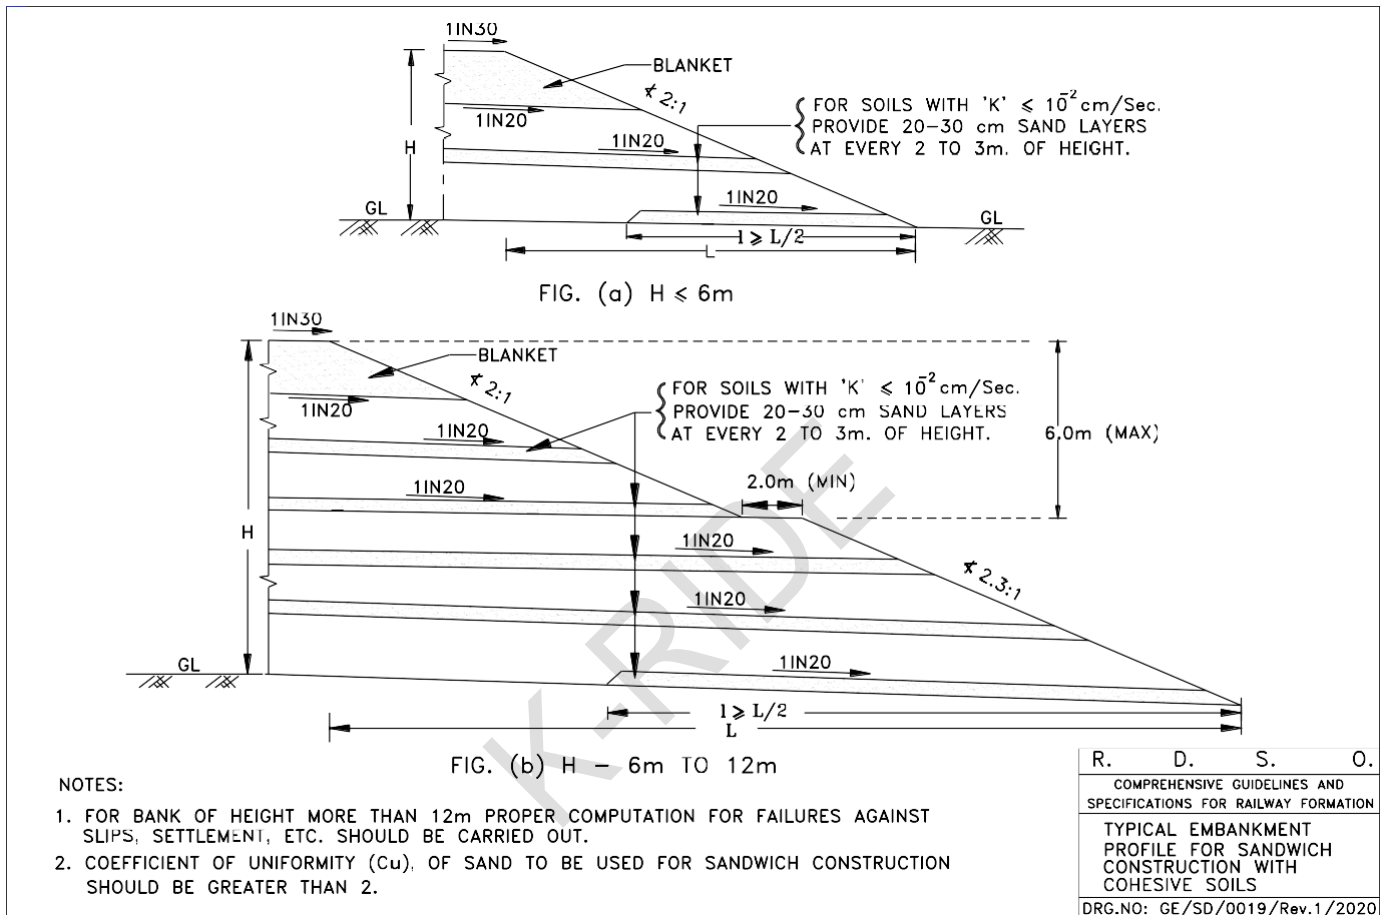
Typical embankment profile for sandwich construction with cohesive soil
